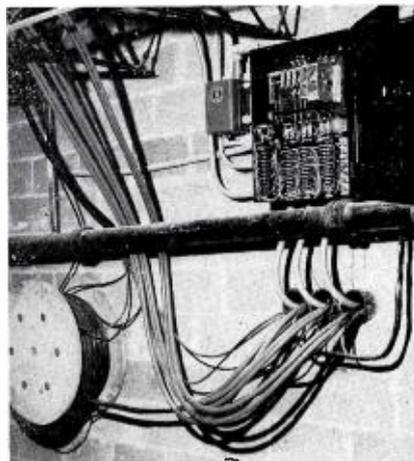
(above). View of conduit entrance to building, junction box with tower light flasher, photo-electric motor starter, and (at left) reel of surplus sampling line from #2 and #3 towers.
